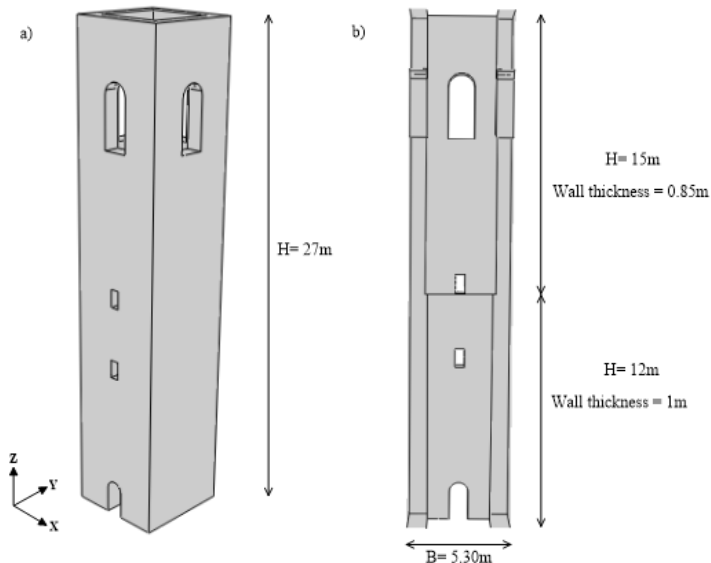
1 – a) 3D CAD model of the masonry tower; b) vertical section of the structure.
